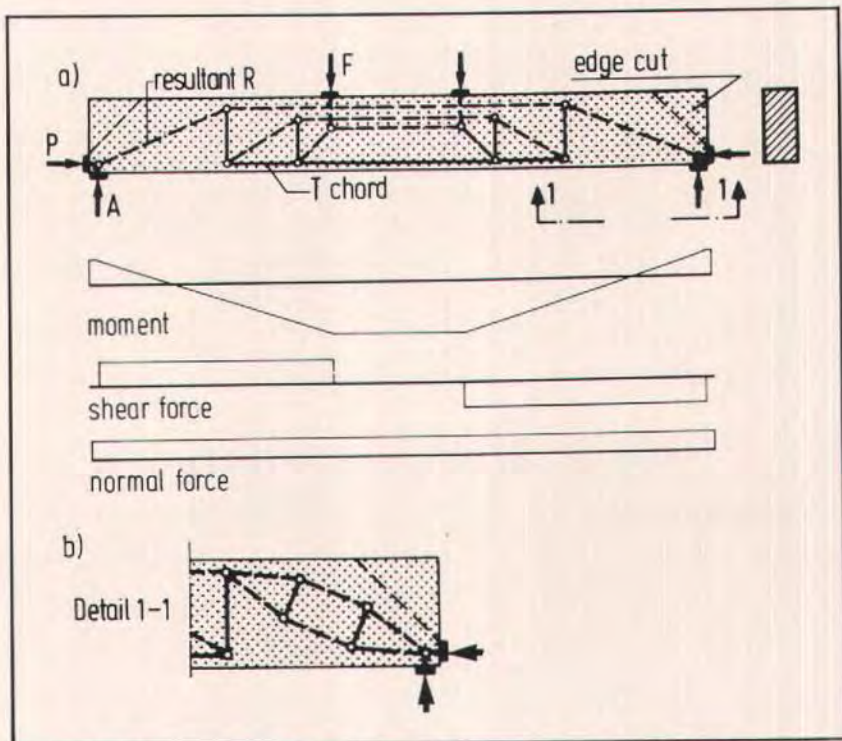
(a) Strut-and-tie-model of a partially prestressed beam with rectangular cross section; (b) detailed strut-and-tie-model of the beam area, where the resultant is within the beam section.
